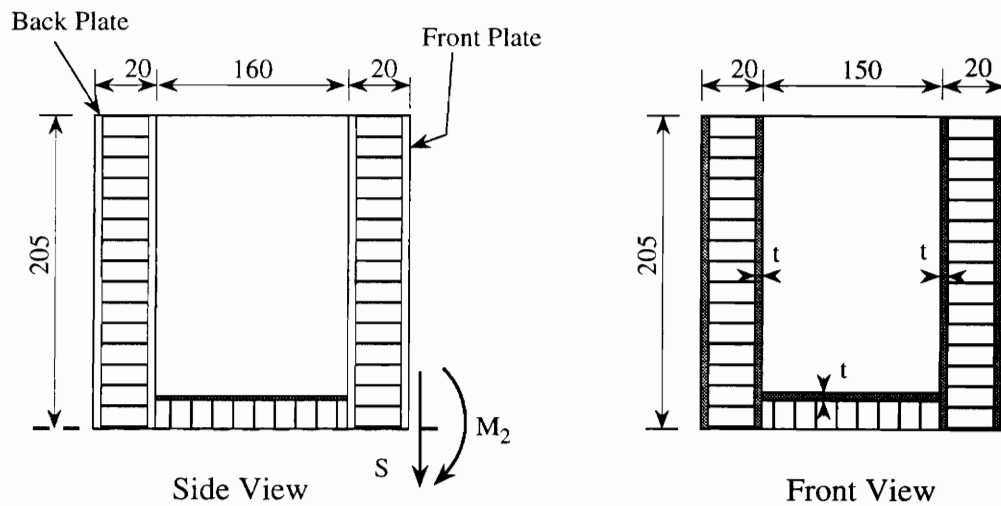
Stiffeners layout of the support (dimensions in mm).
